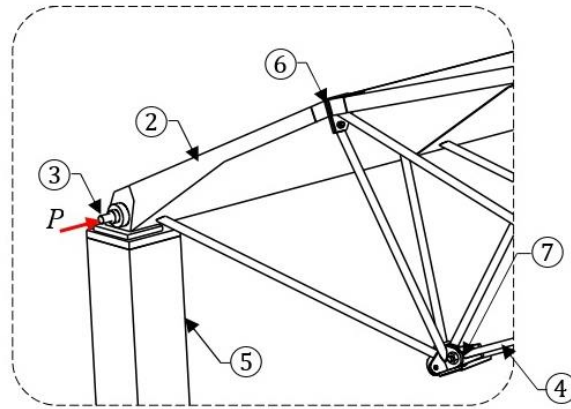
Prestressing of reinforcement by tensioning on concrete by force P
